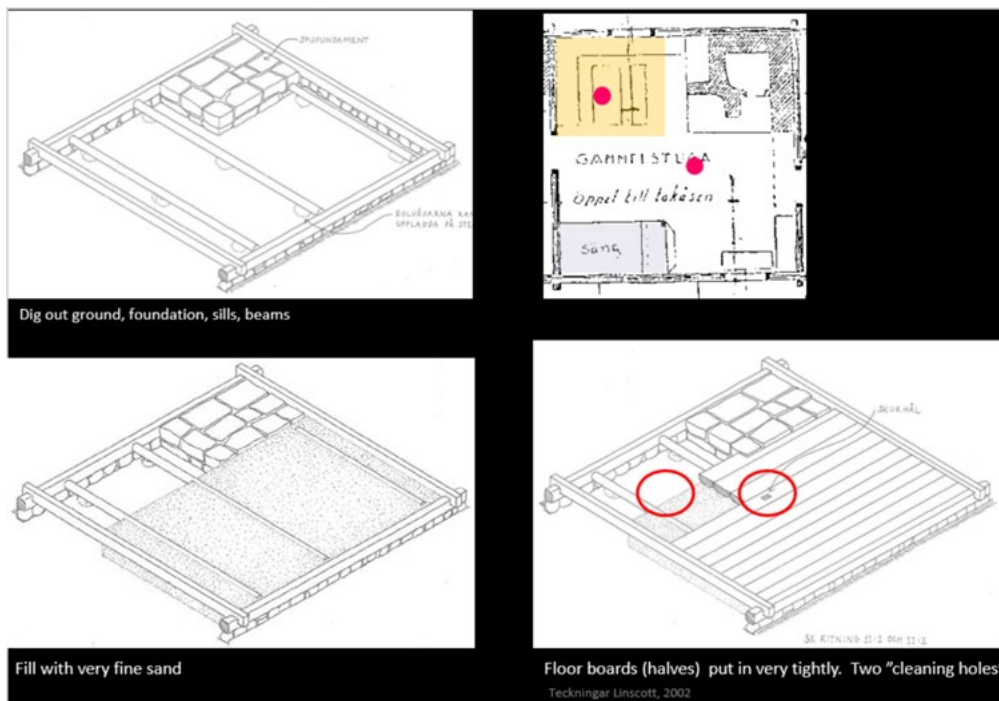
Reconstructions of insulation layers in floor and ceiling (Blomberg and Linscott 2004).
